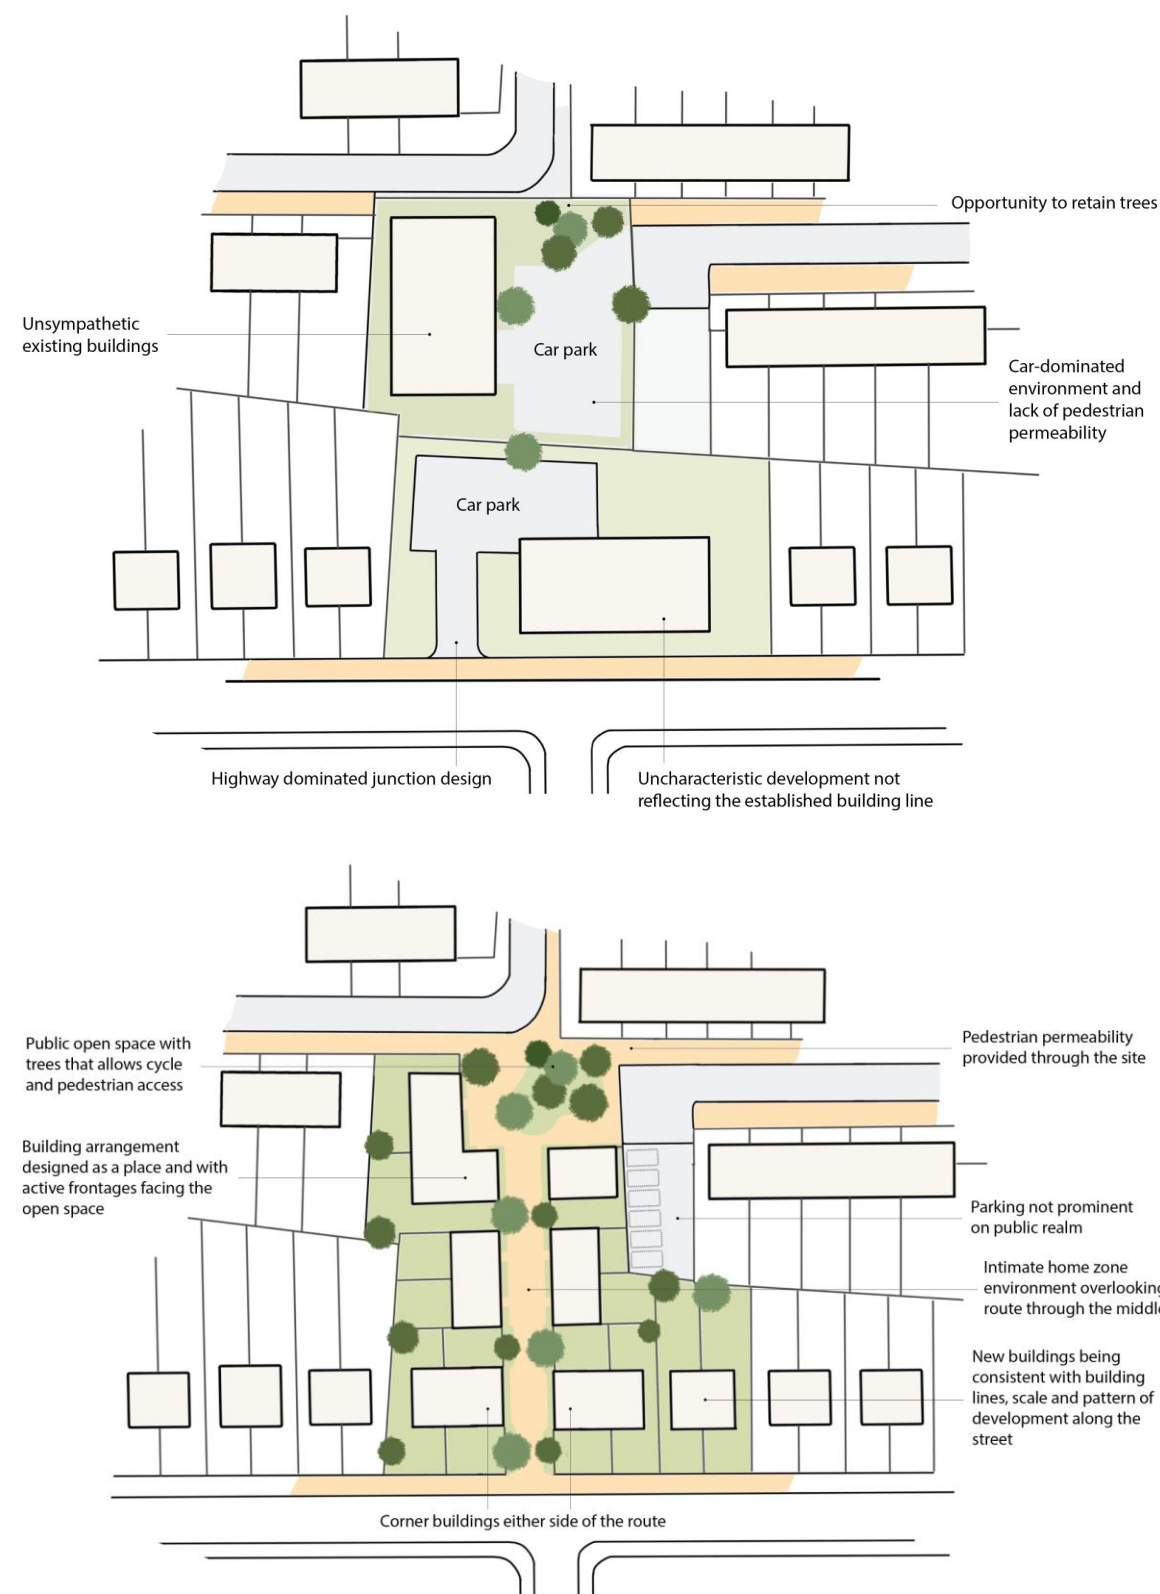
The image above (top) shows a typical small site opportunity between two streets. Development of such sites should take the opportunity to connect surrounding streets, supporting movement and permeability (bottom). Such routes should be pedestrian priority places and where the impact of vehicular movement caused by through traffic is restricted. The layout of development should respond positively to the established development pattern, respecting existing building lines, the scale and form of development.
